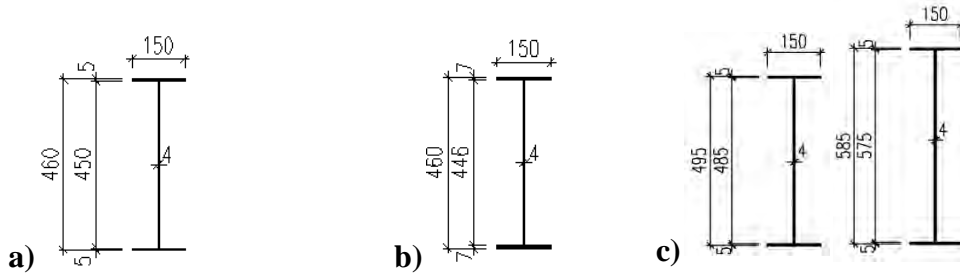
Cross-section: (a) Test 1; (b) Test 2; (c) Test 3
